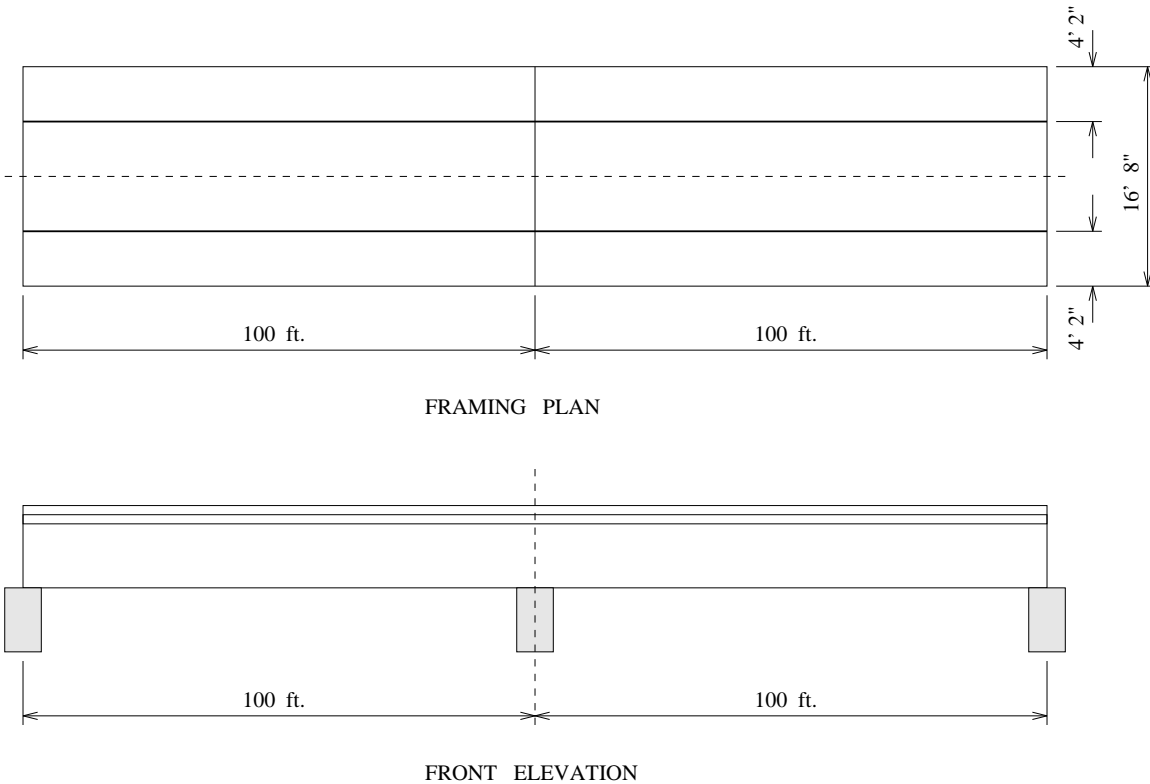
Highway Bridge : Plan and Front Elevation of Two-Span Continuous Highway Bridge
